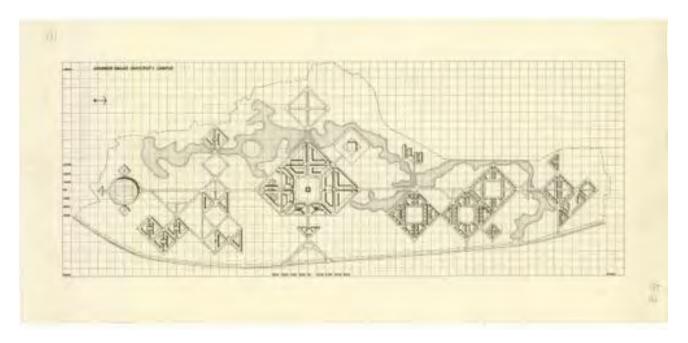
a: Master plan of Jahangirnagar University. Source
